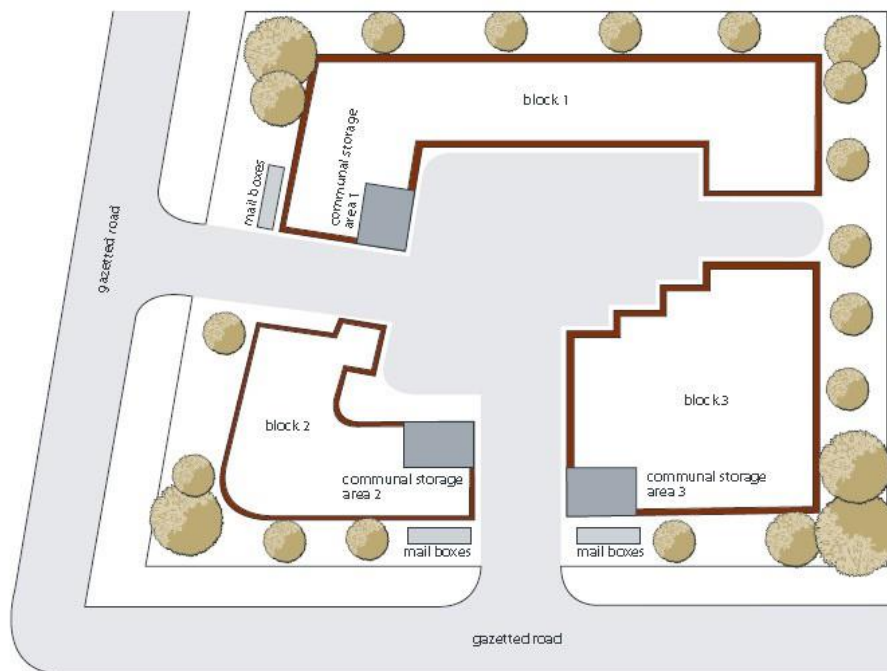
Example of Communal Storage Area for Bulk Bins suitable for Residential Flat Buildings Greater than 12 Dwellings.
